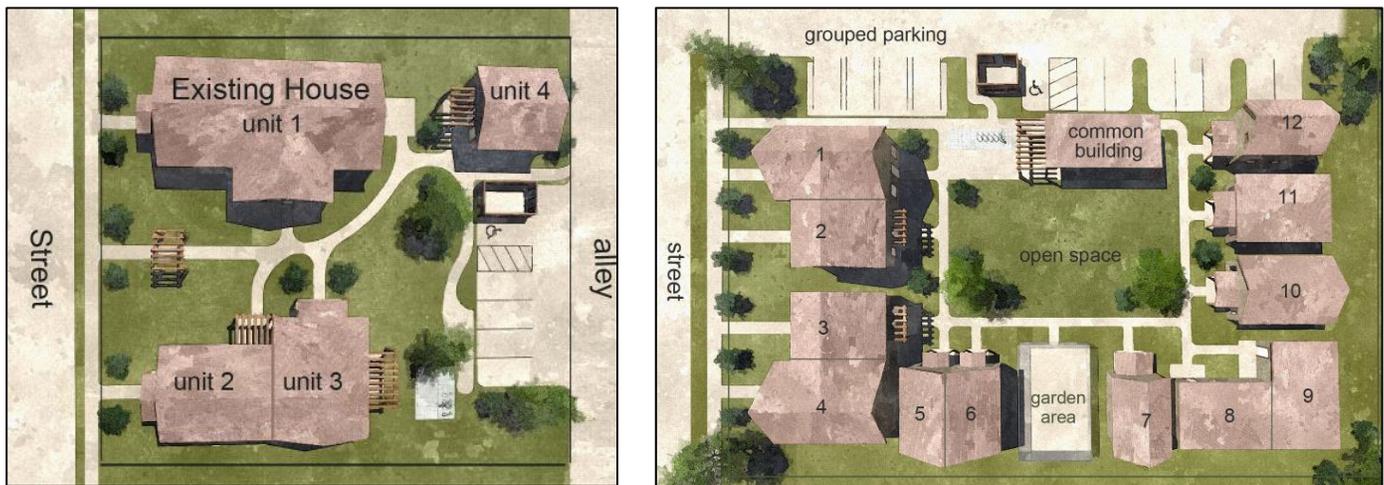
Cottage Housing Conceptual Site Plans
